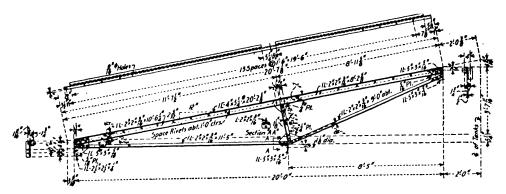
DETAILS OF STEEL ROOF TRUSS FOR STEEL BINS, INDEPENDENT ELEVATOR.
